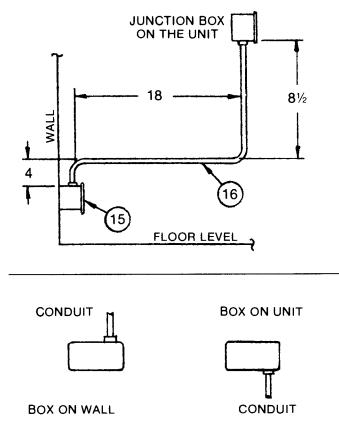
B ELECTRICAL THIN WALL RIGID CONDUIT LAYOUT SIDE VIEW
